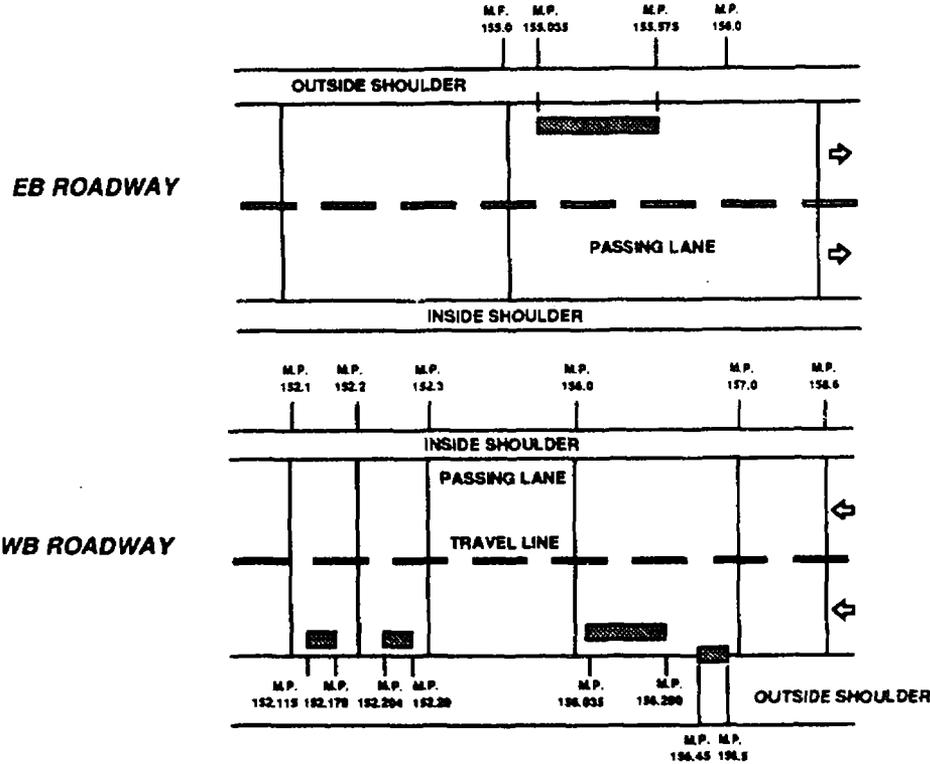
NDT Test Locations (1987, 1988 and 1989 Testing).
